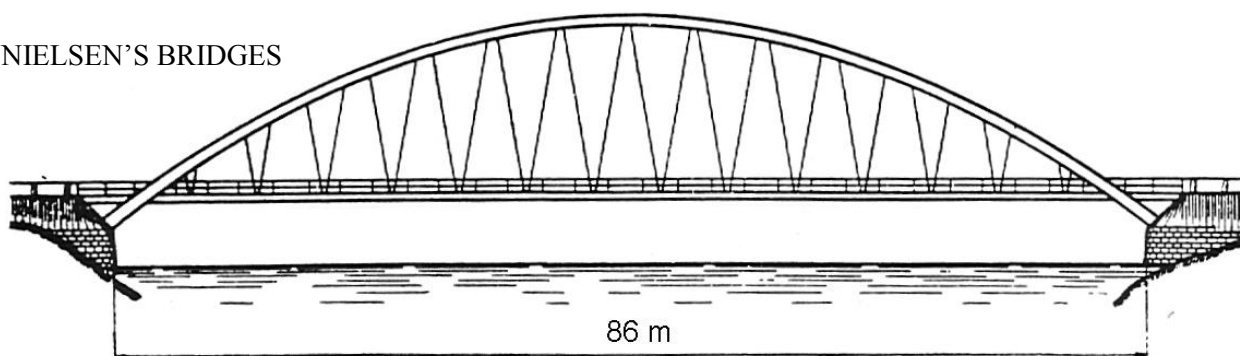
Bridge over Øster-Dalelven in Sweden. Design of this bridge started in 1921.
